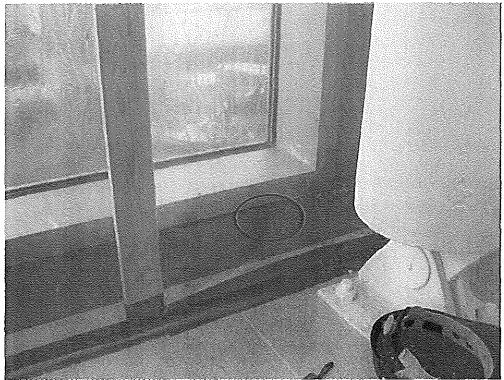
Water originating from underneath Specimen #3 and tracking down the curb wall
